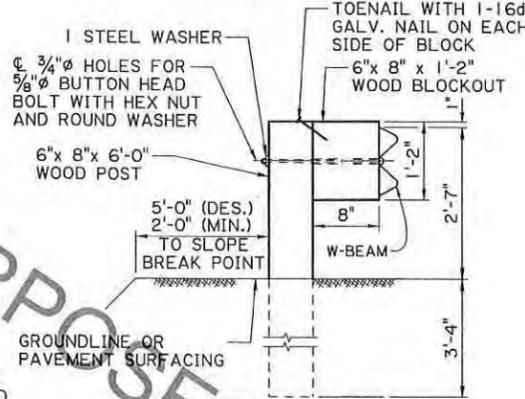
" x 8" x 6'-0" WOOD POSTS AND WOOD BLOCKS-STD. GUARD RAIL
